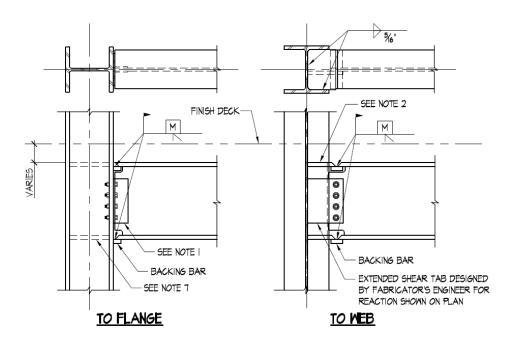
/ Beam to Column - Fully Restrained Moment Connection
